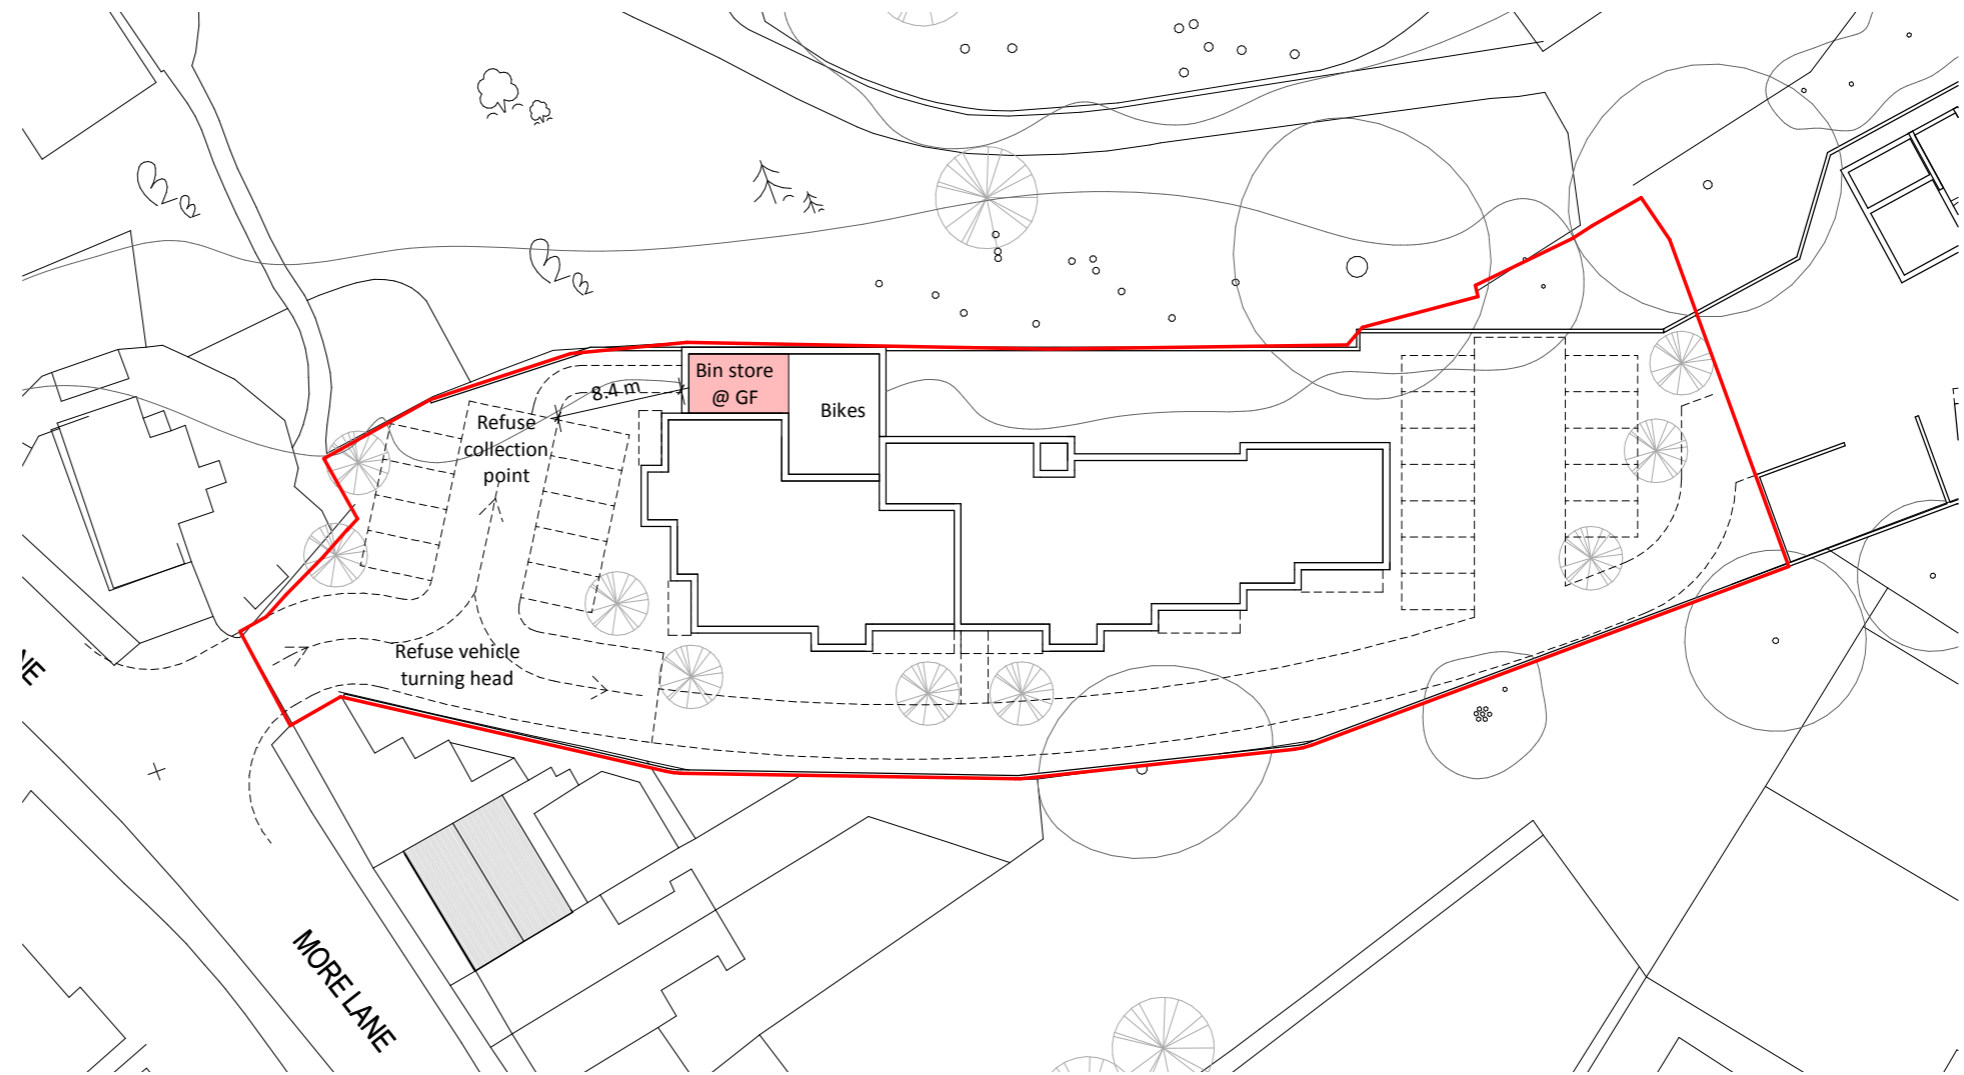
Illustrative Refuse Strategy Layout Site 1
